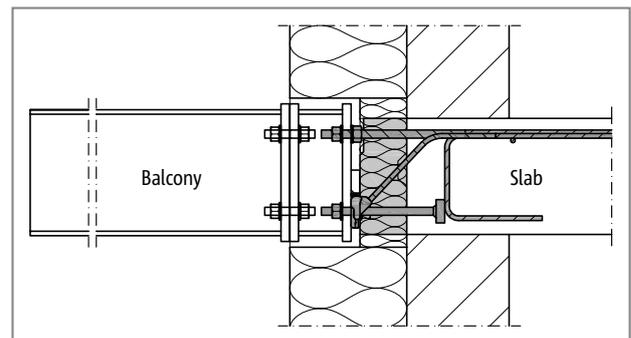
Schöck Isokorb® T type SK: Connection of the steel member to an adapter that equalises the thickness of the outer insulation
